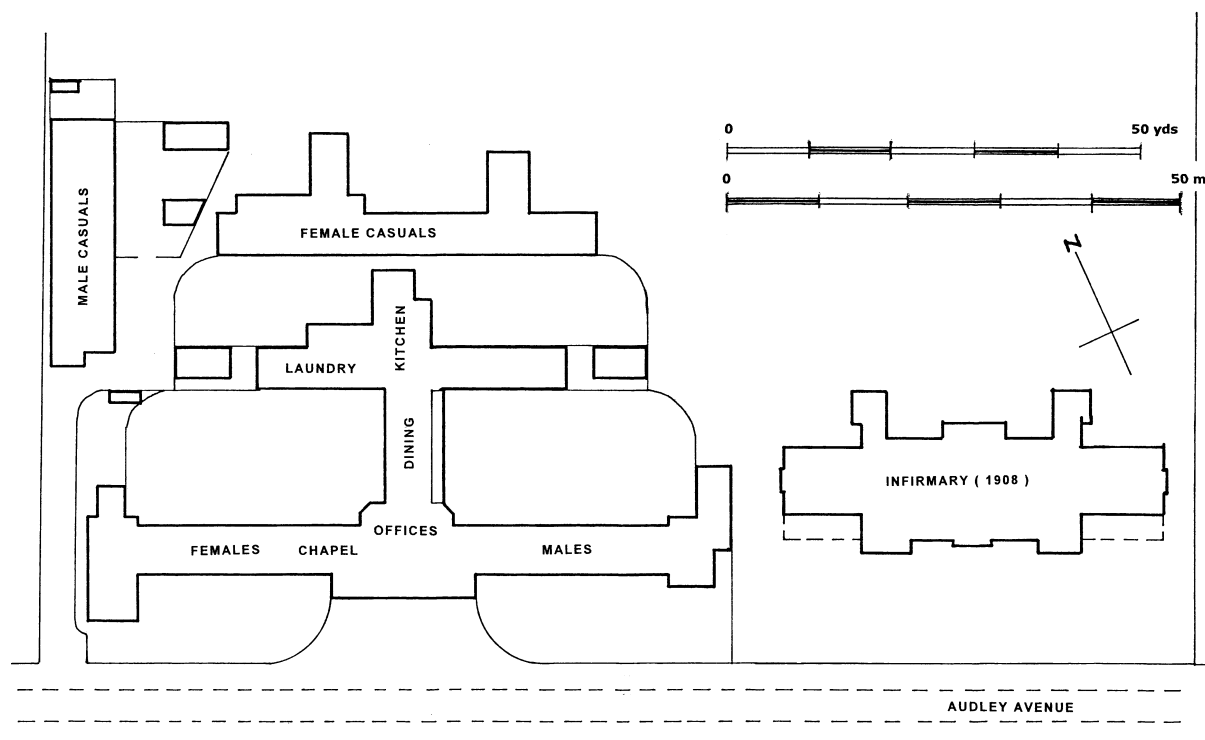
Block plan of Newport Union Workhouse site in the early-20th century. (Based on detailed plan of Audley House at front of site (c.1932) and an undated early-20th-century plan of the casual wards at the rear.)
